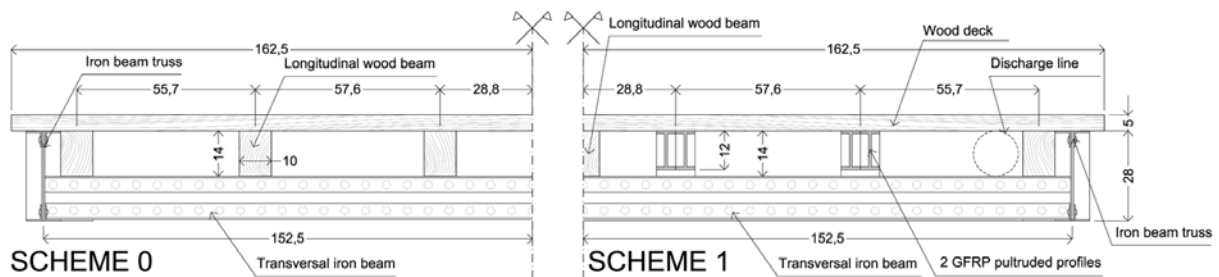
, Detail of cross section deck, scheme 0 and 1
